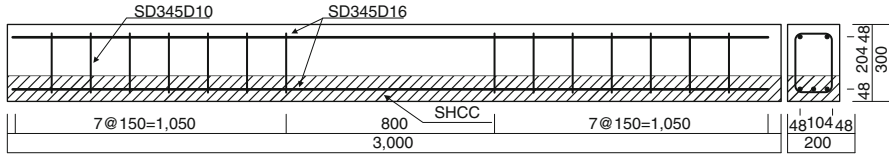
Test specimen for evaluation of flexural cracking of SHCC
